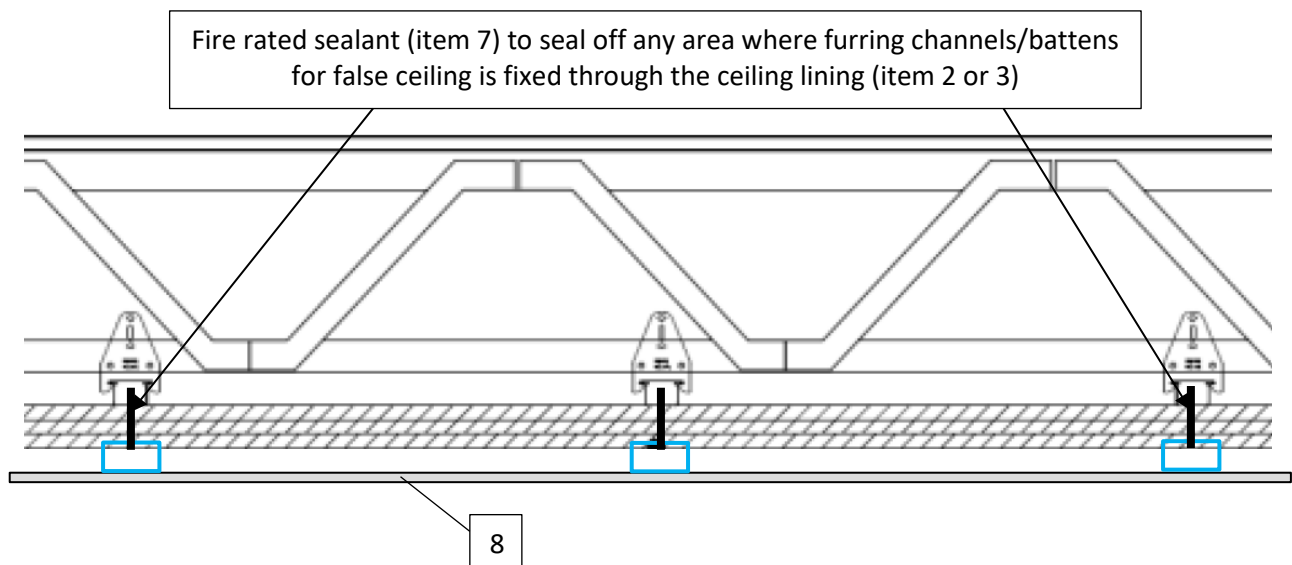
Floor-ceiling system with a false ceiling beneath fixed to Ceiling suspension systems. Refer to Figure 1 for Floor-ceiling system detail.
